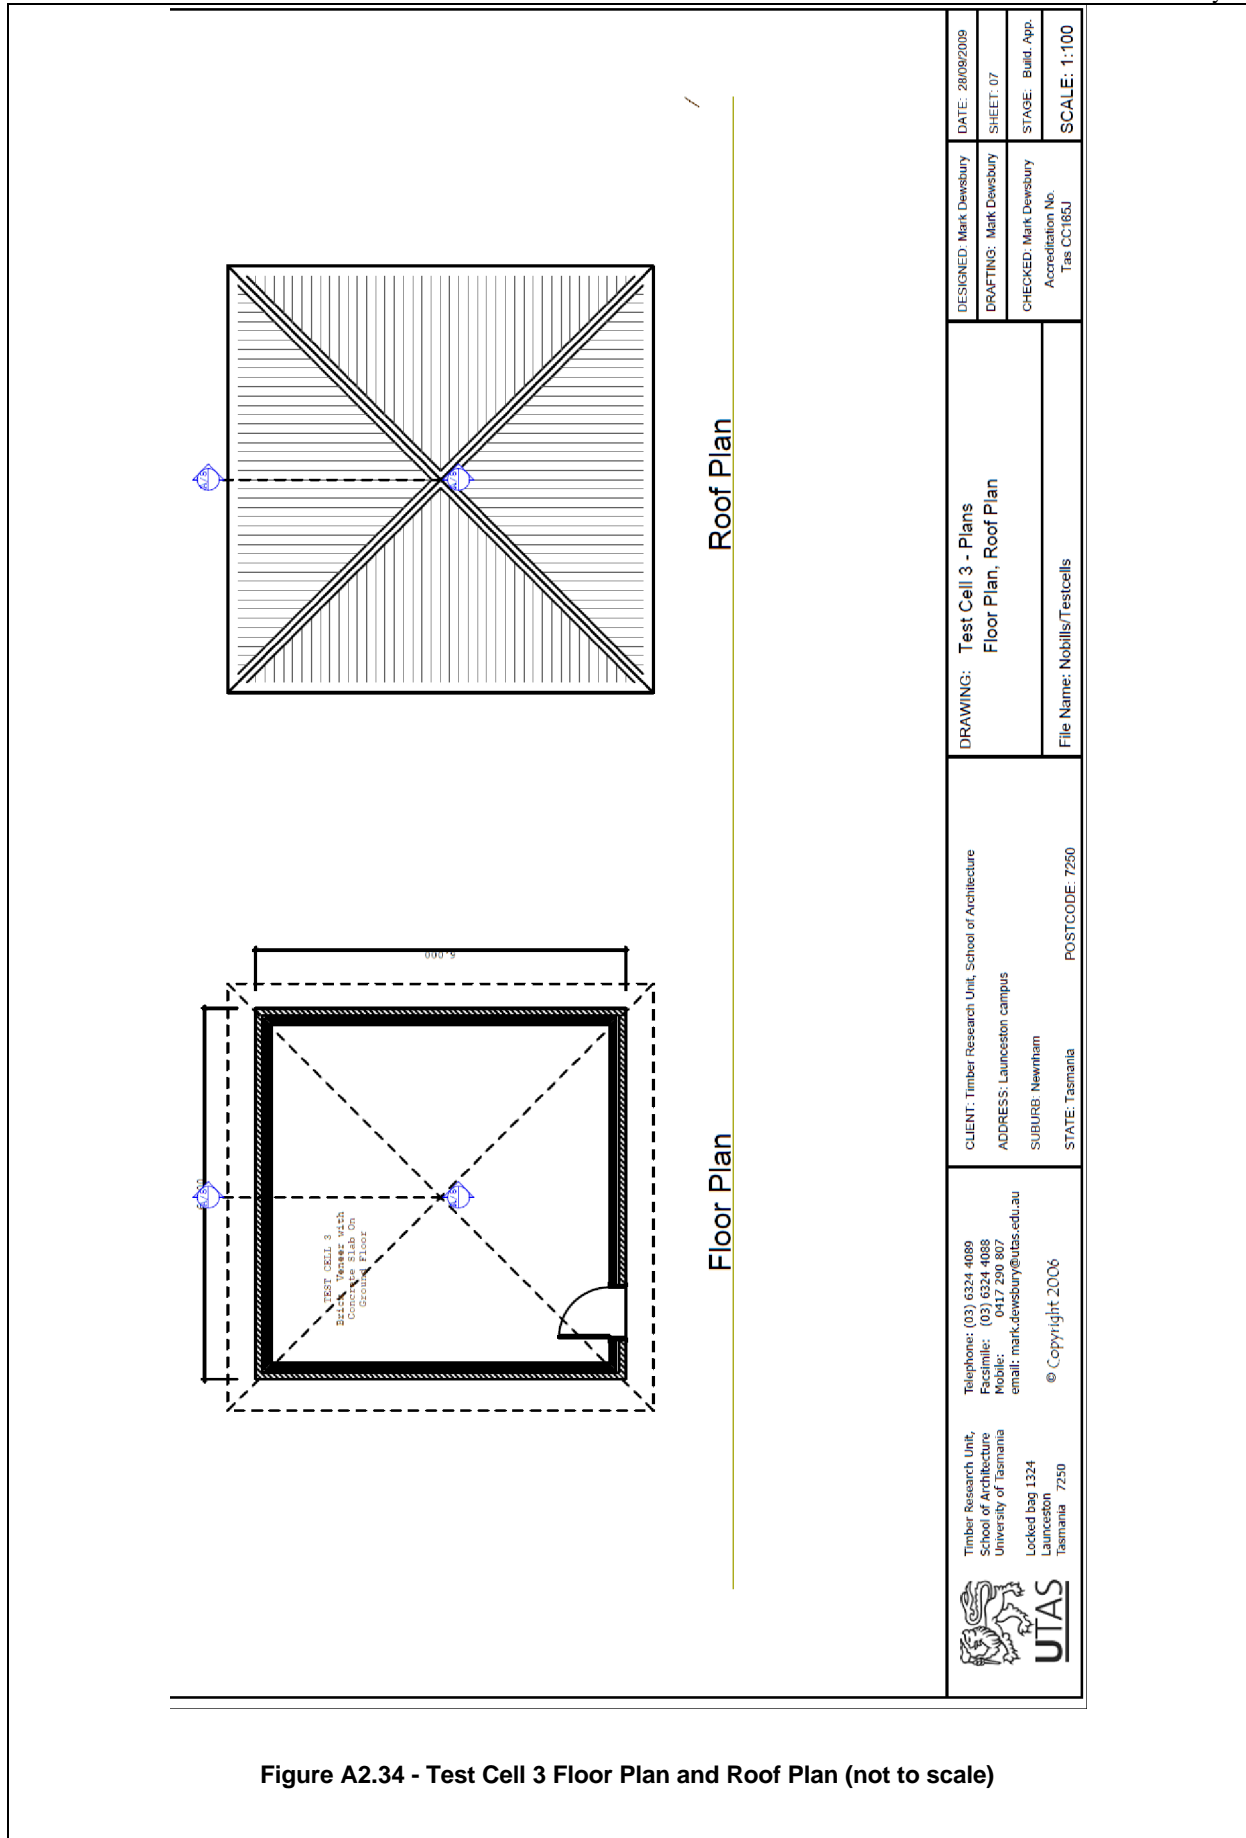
Test Cell 3 Floor Plan and Roof Plan (not to scale)
